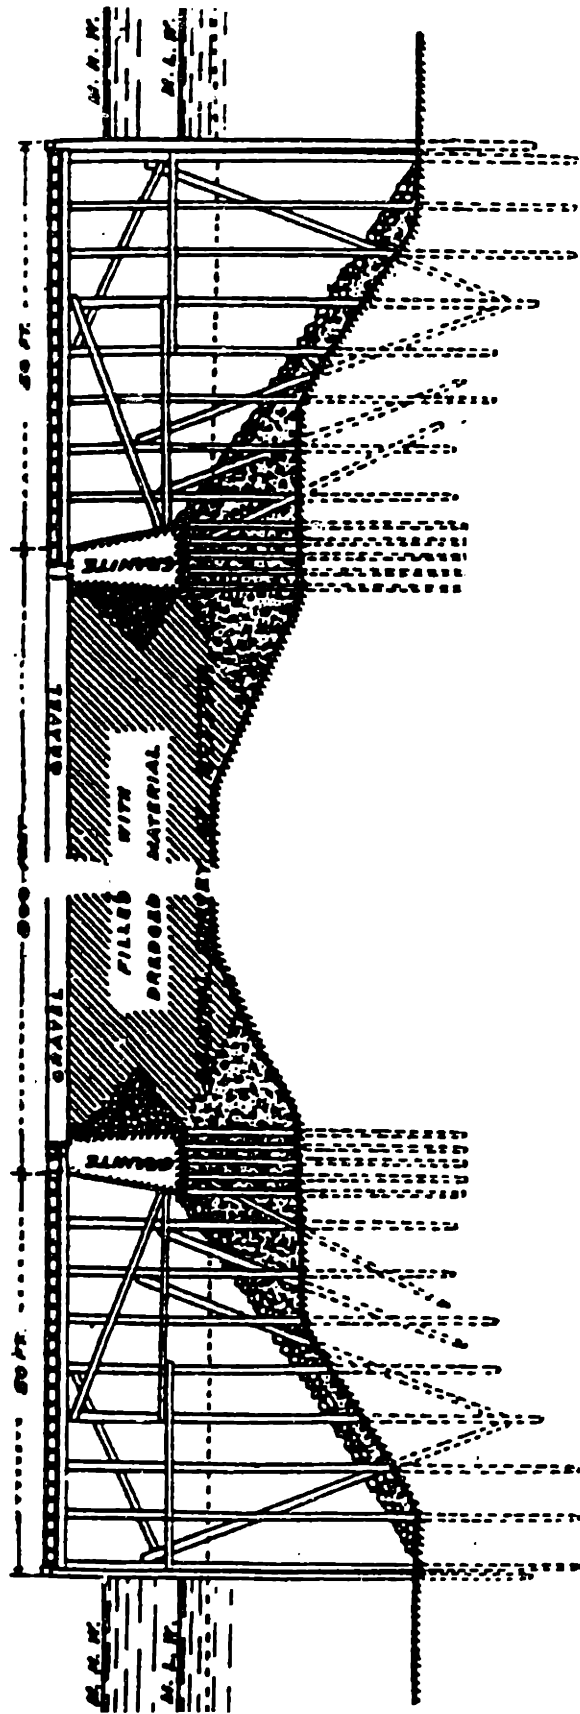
Typical Cross-section of Commonwealth Pier (Harbor and Land Commissioners, 1910)
